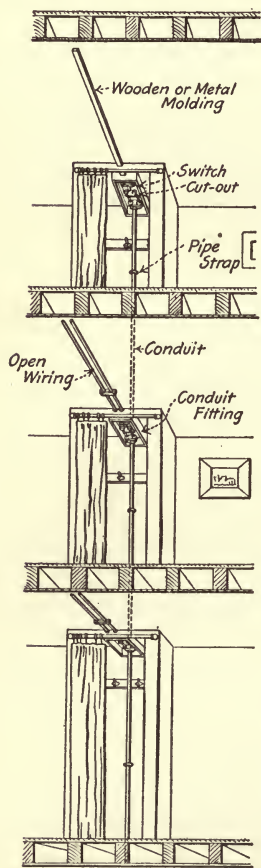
Vertical conduit run to serve different floors or different apartments.
